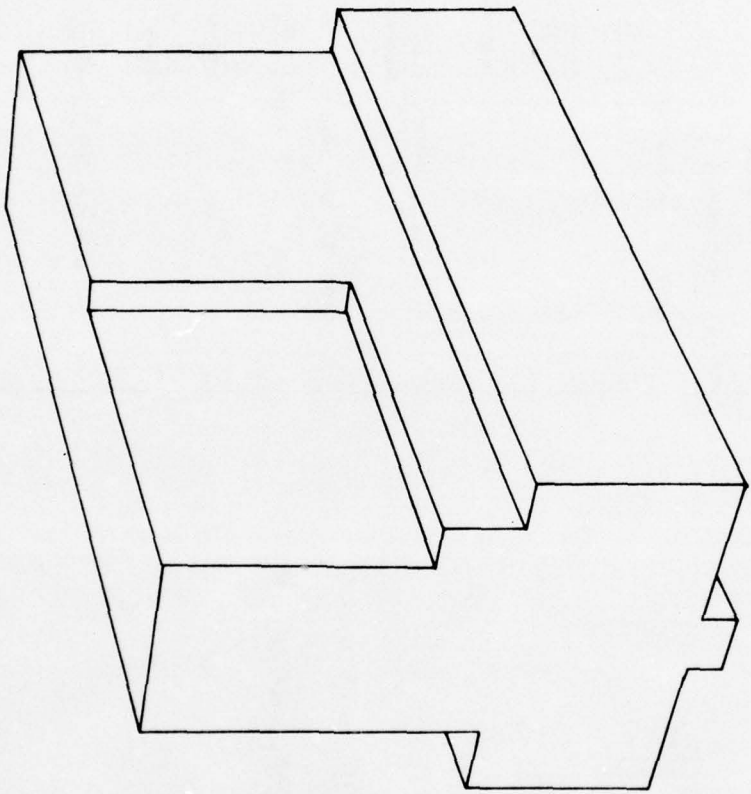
LAND WALL - UPPER GATE MONOLITH L-17
